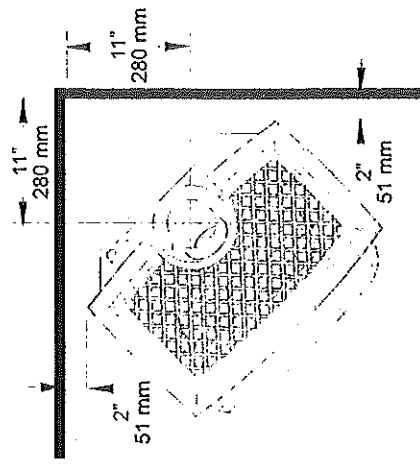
Vent adaptor centerline at minimum clearance to corner walls.
